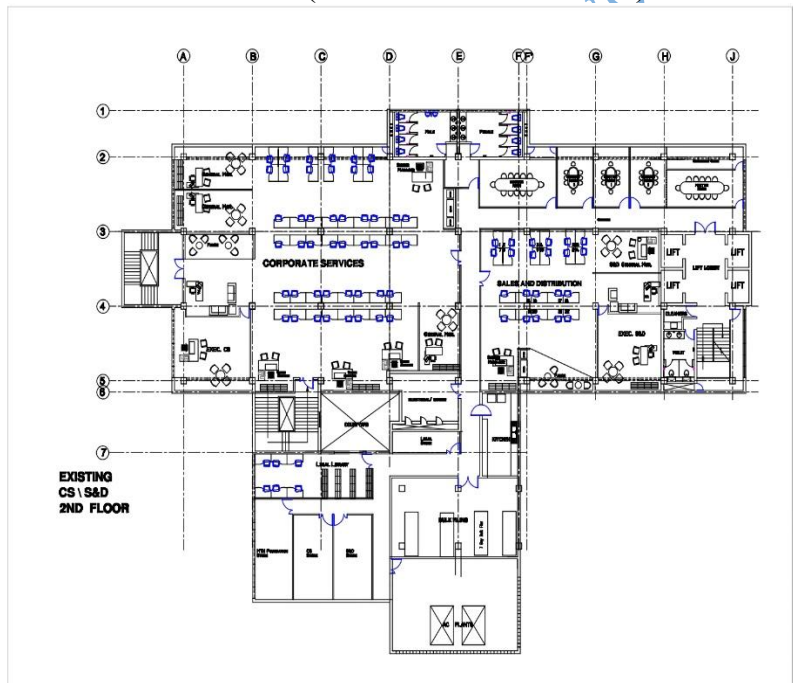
MTN PLAZA Office 2nd Floor Plan
